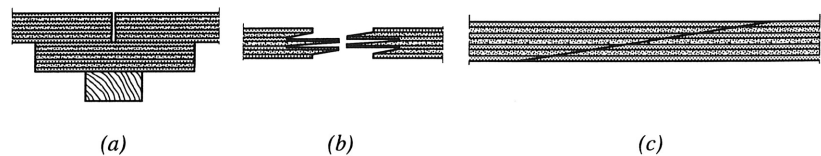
Glued joints for the connection of flange panels. (a) splice joint, (b) finger joint, (c) scarf joint.
